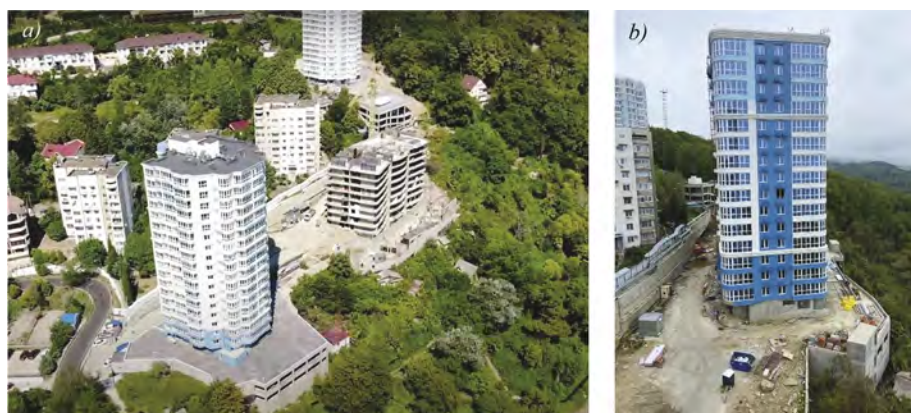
Stages of construction of multi-storey buildings on a landslide slope: *a* – general view of the construction site; *b* – the final stage of construction of section No. 1.
